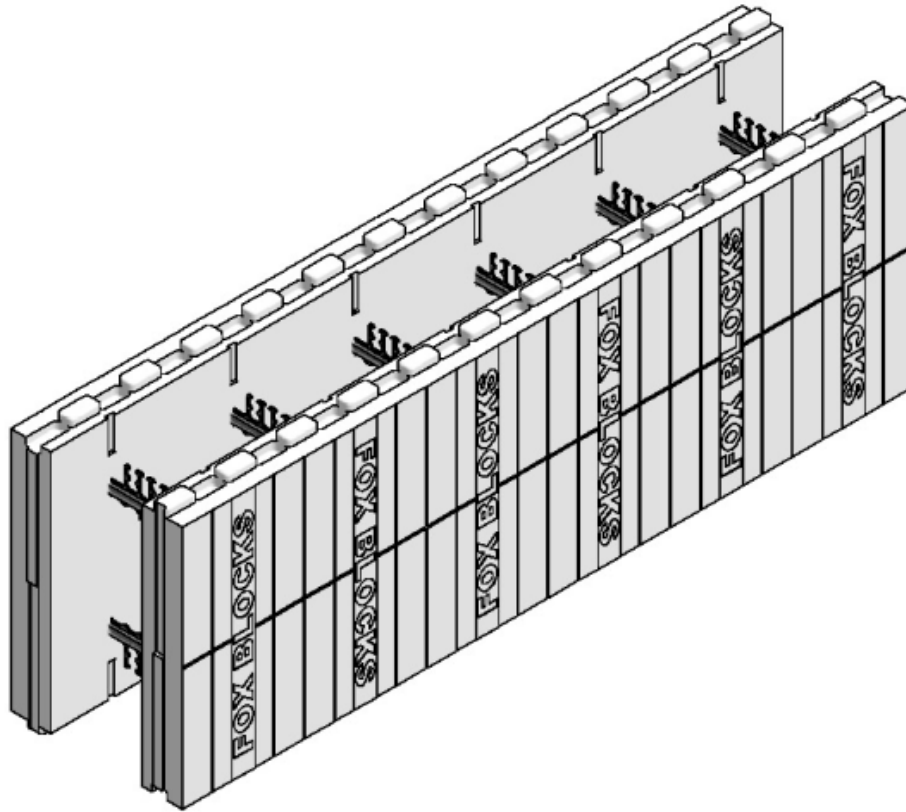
“Fox Blocks Insulating Concrete Form Wall System” standard unit
